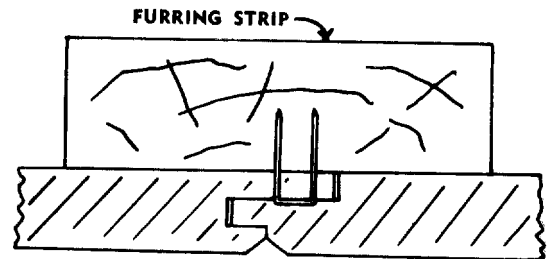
Section Through Tileboard Joint Showing Application by Staple Method.
